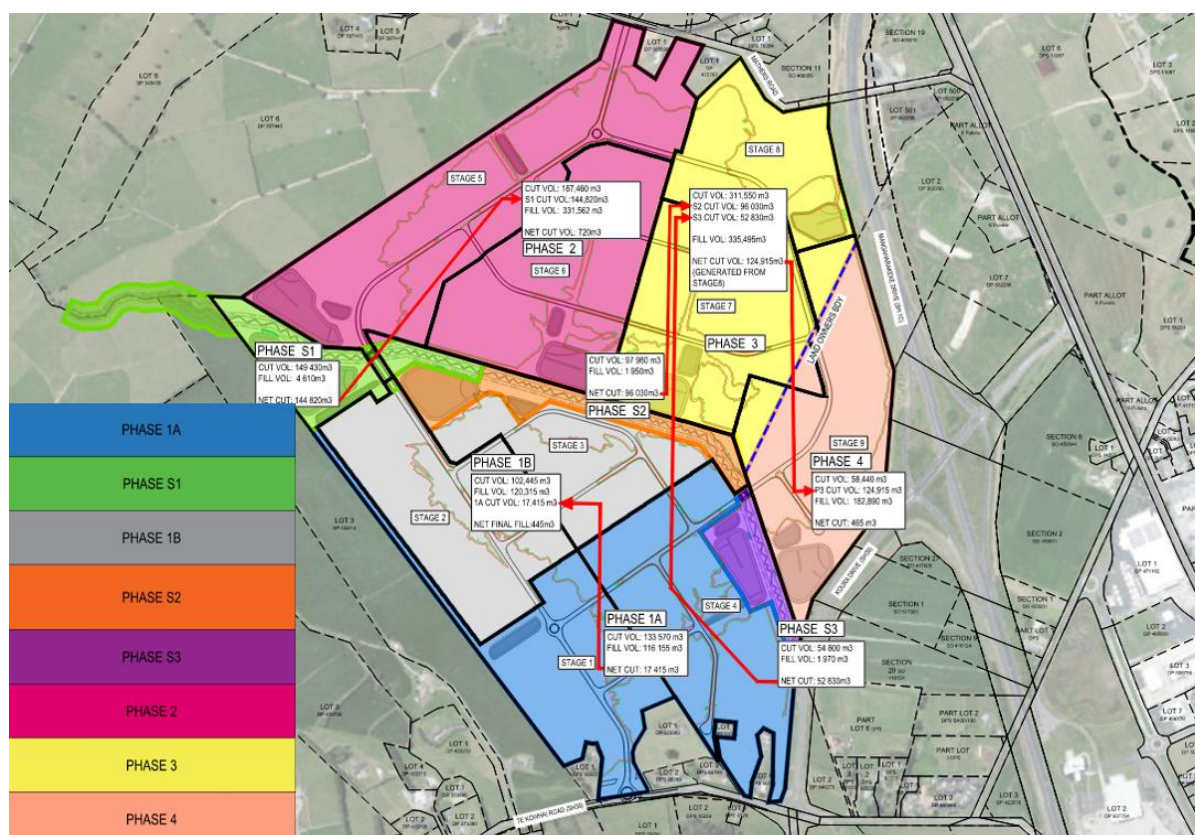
Earthworks Staging Plan (Maven Associates drawing C221).
